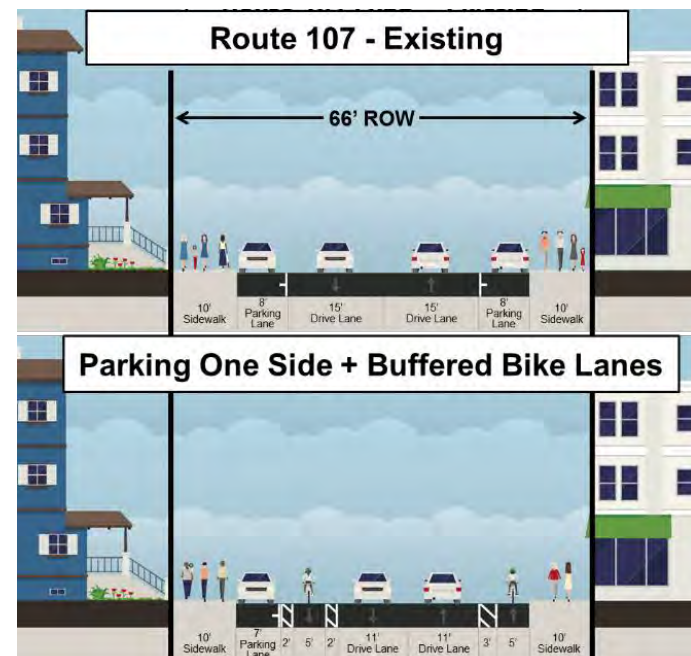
Potential Cross-Section – Parking One Side + Protected Buffered Bike Lanes
